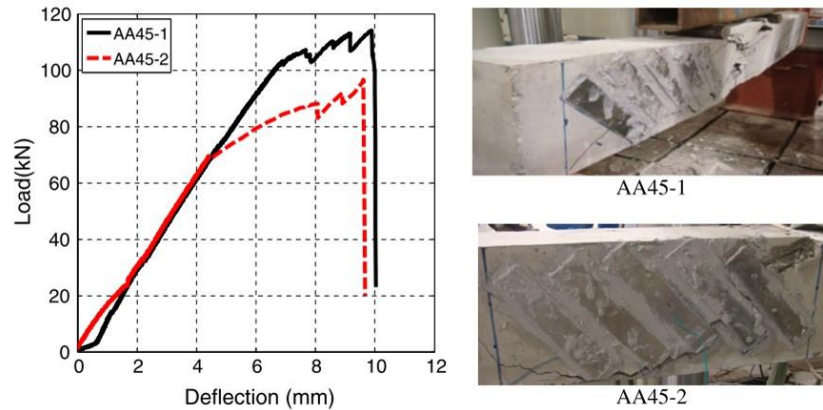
(#) External bonding of steel plates with different arrangements [2]
